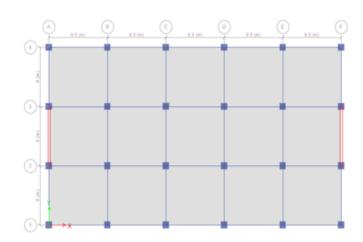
Model 2 – Floor plan of the dual system with shear wall on side of the structure.
